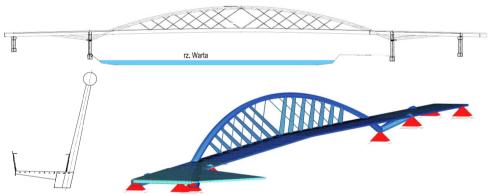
Modified design. Elevation, cross section and FEM SOFiSTiK model.
